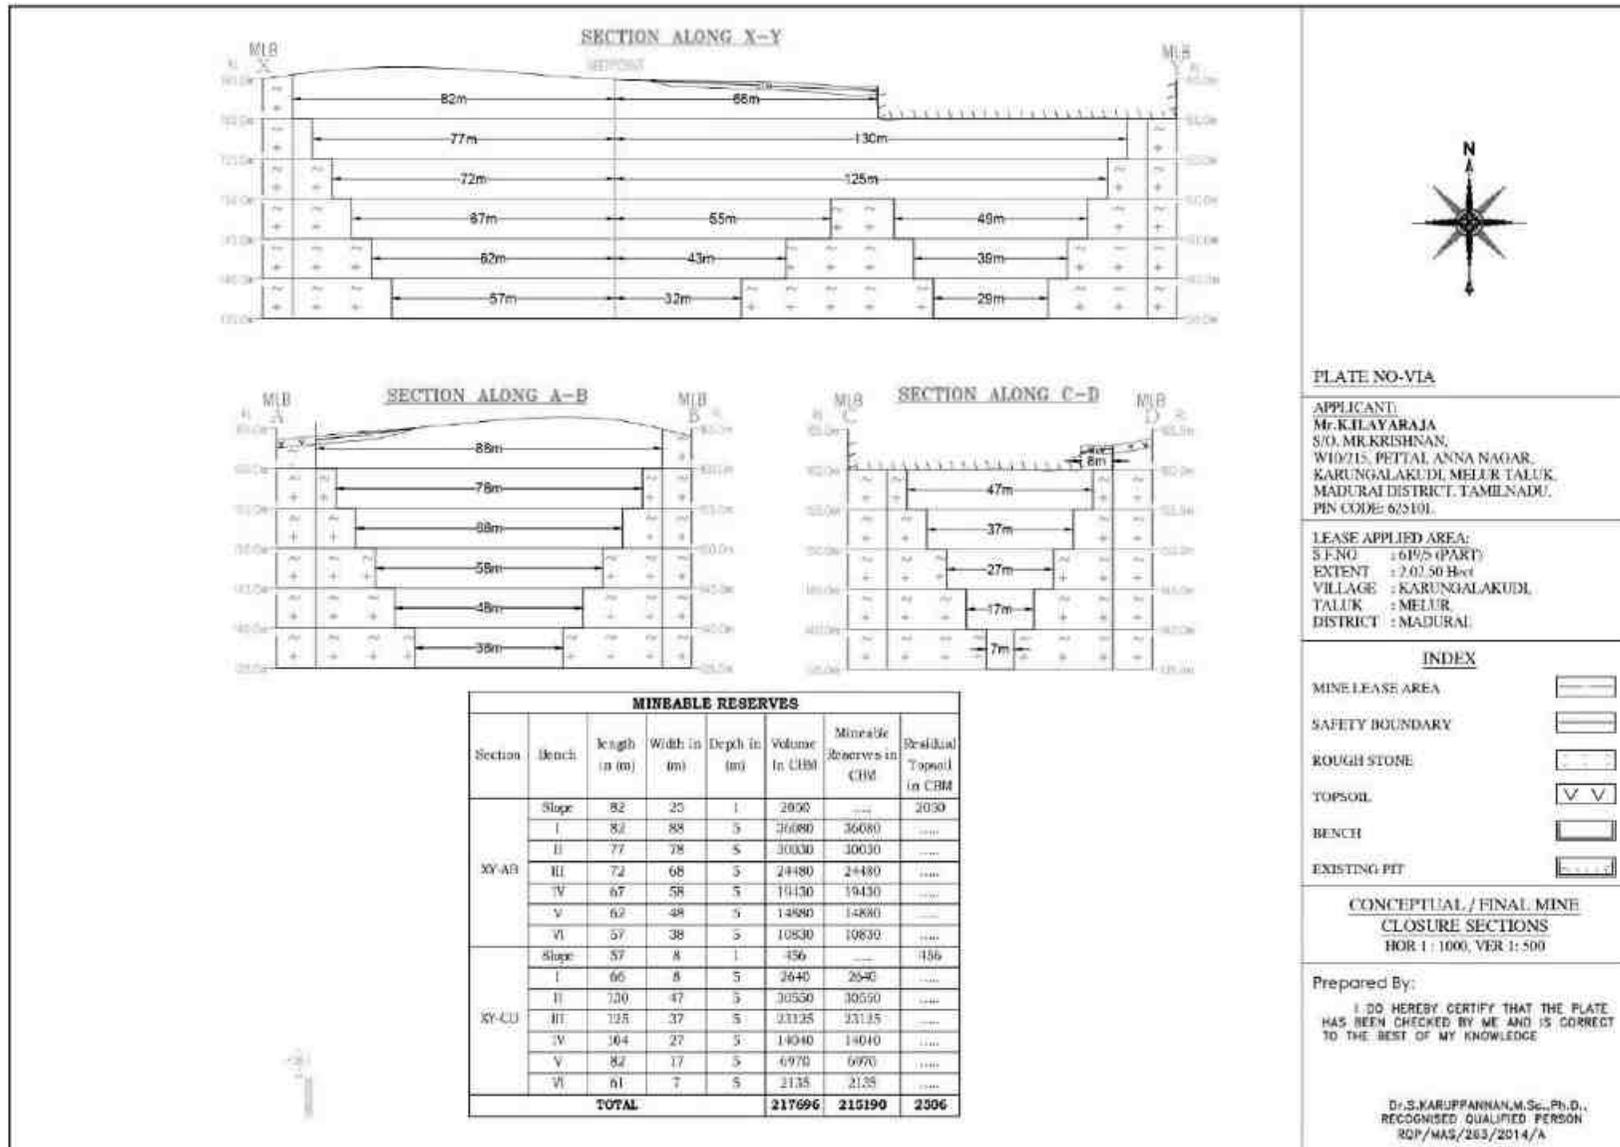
Conceptual Final Mine Closure Plan and Sections
